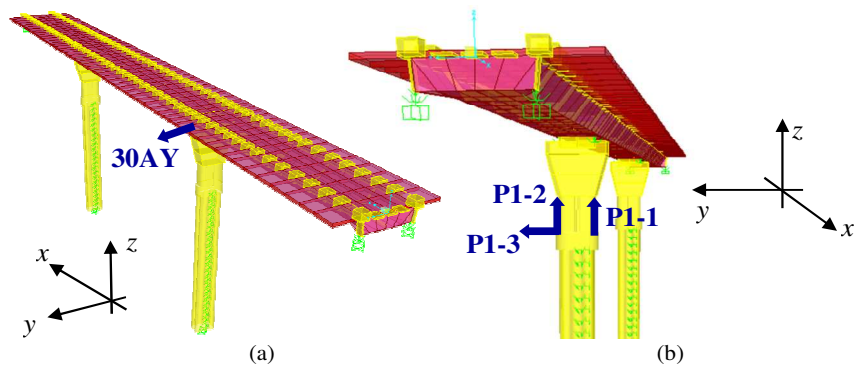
Configuration layout of P1 in “Cesano bridge”: (a) global view, (b) detail of one pier
